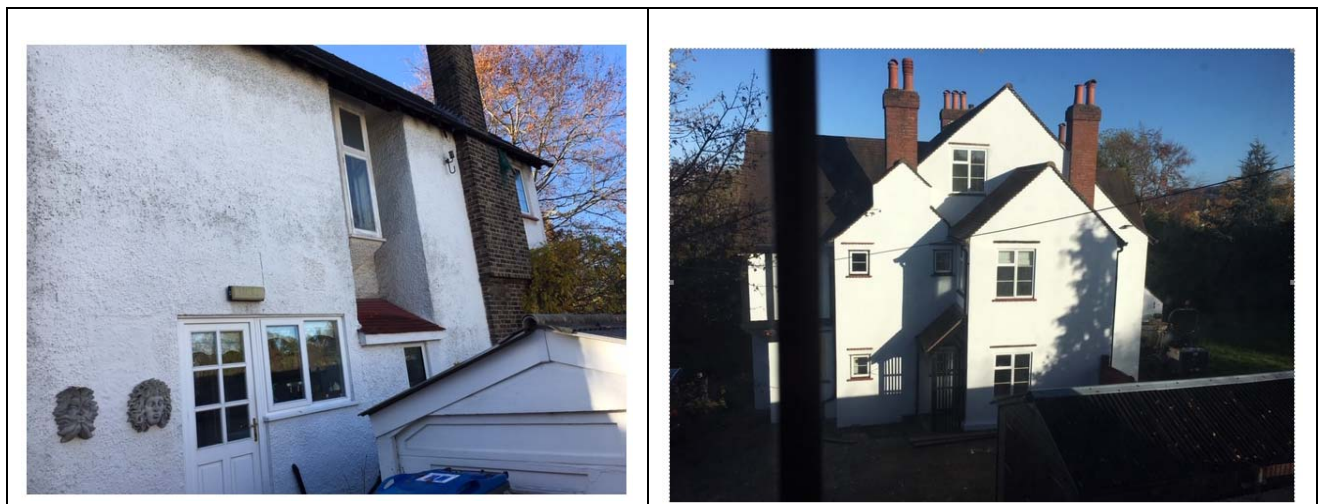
Photos highlighting the existing flank elevations between 33 (left) and application site (right)
